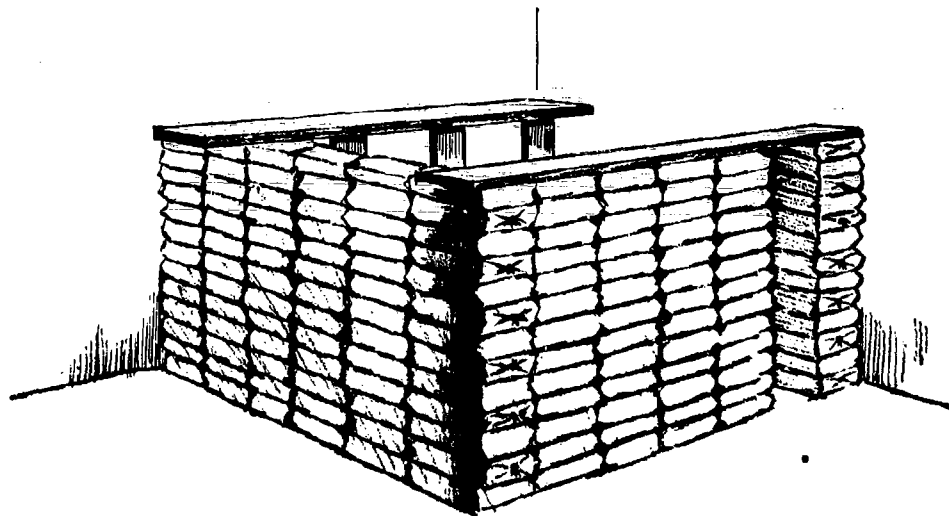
Sandbag Shelter Showing Completed Walls and Roof Supports
